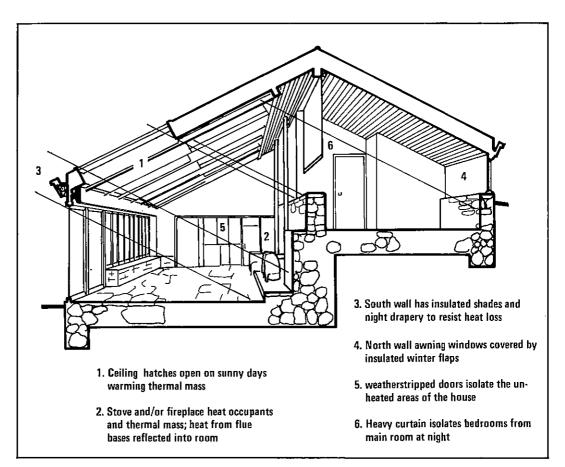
Example of section of a passive building with a direct gain system. (Section 3)
